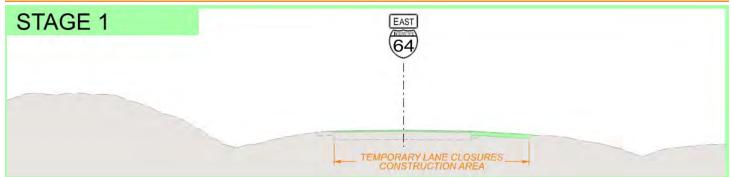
TMP Typical Sections, Stage 1
